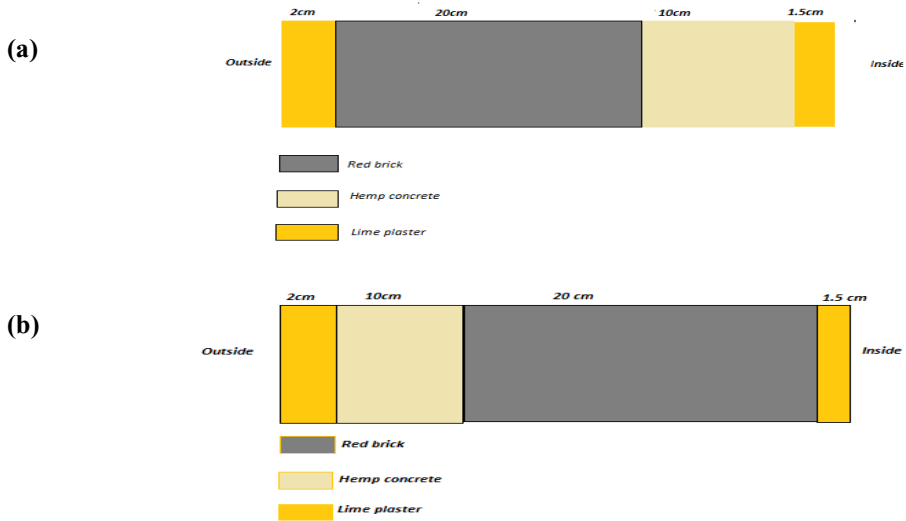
Configuration of the two wall systems: Wall a (interior hemp concrete insulation) and Wall b (exterior hemp concrete insulation)
